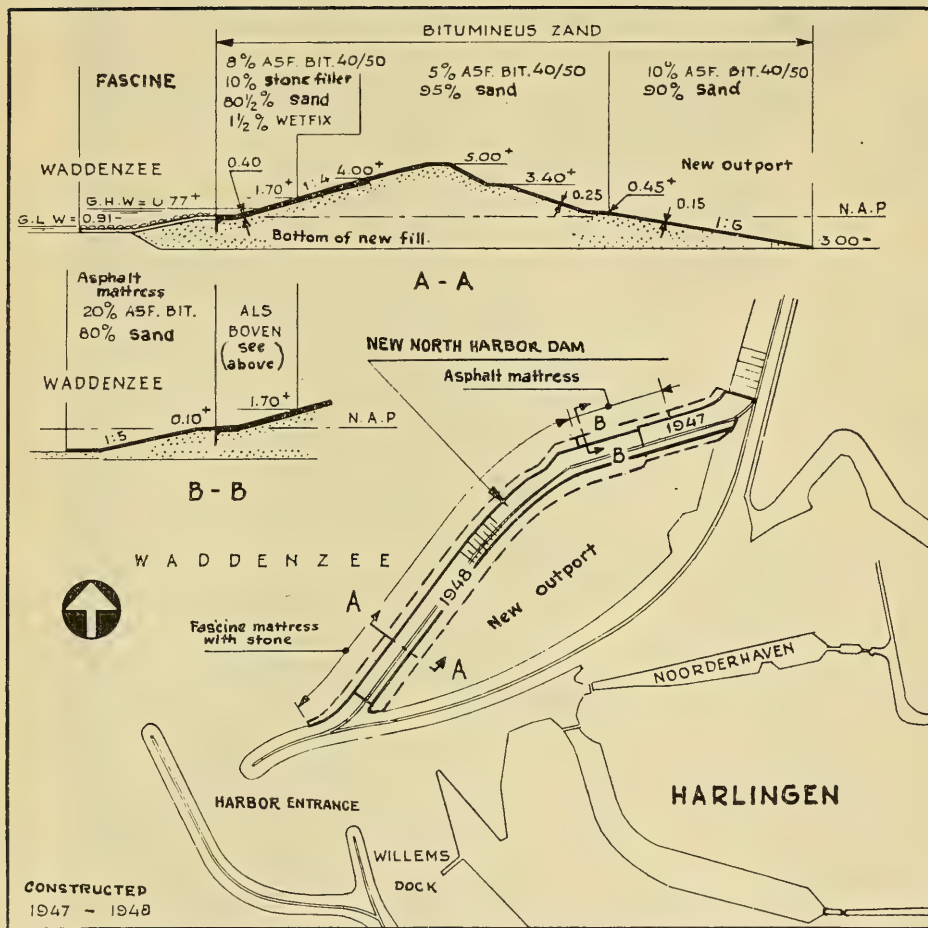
Sheetting of the new north harbor dam at Harlingen with bituminous sand and asphalt mattress.
